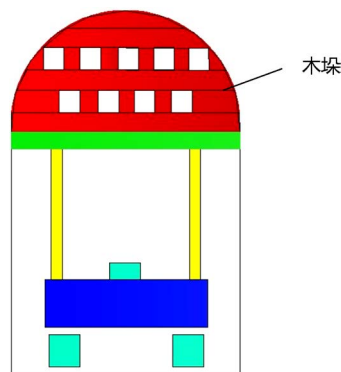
Schematic diagram of erecting rafts on flat steel plates after the foundation of the archway roadway
